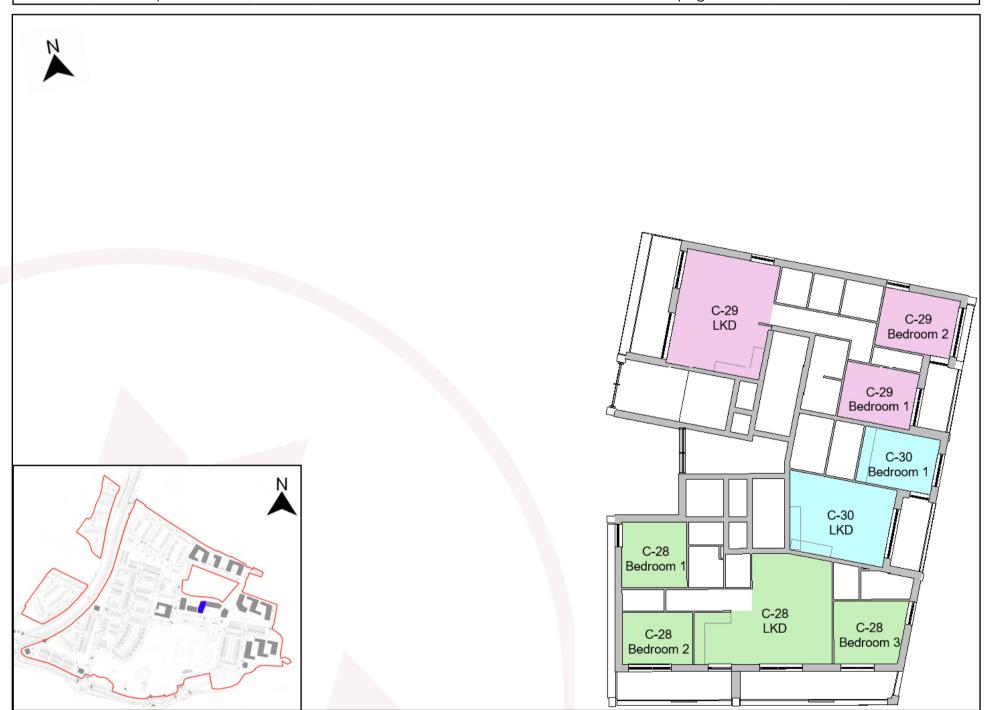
Keyplan highlighting the assessed building (L), Floor plan of assessed building (R).
